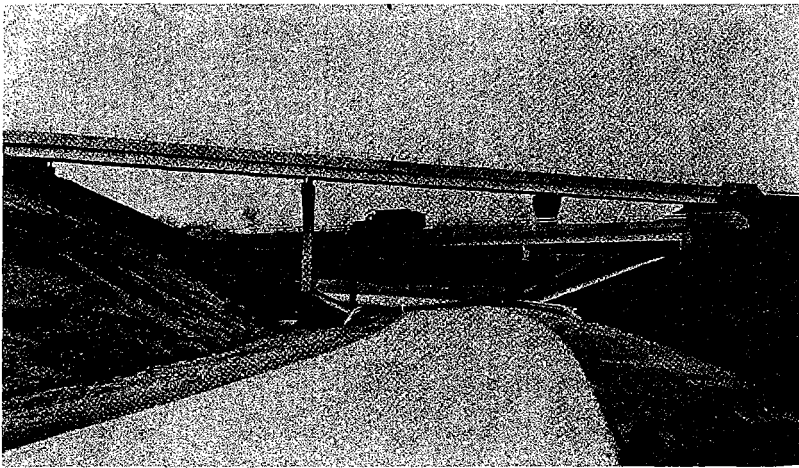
I-74 slide area looking west at overall view of top and side slope of the stabalizing berm.
